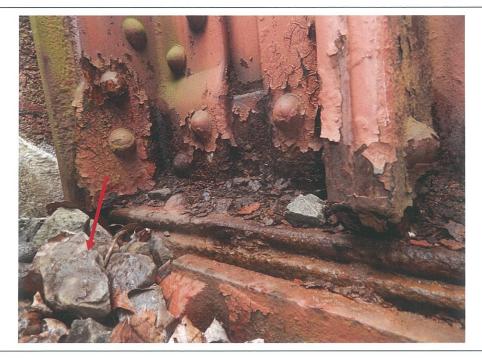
Missing sole plate bolt at the north side of Girder G3 bearing over the east abutment, looking southeast. Note the accumulation of ballast on the bearing seat.
